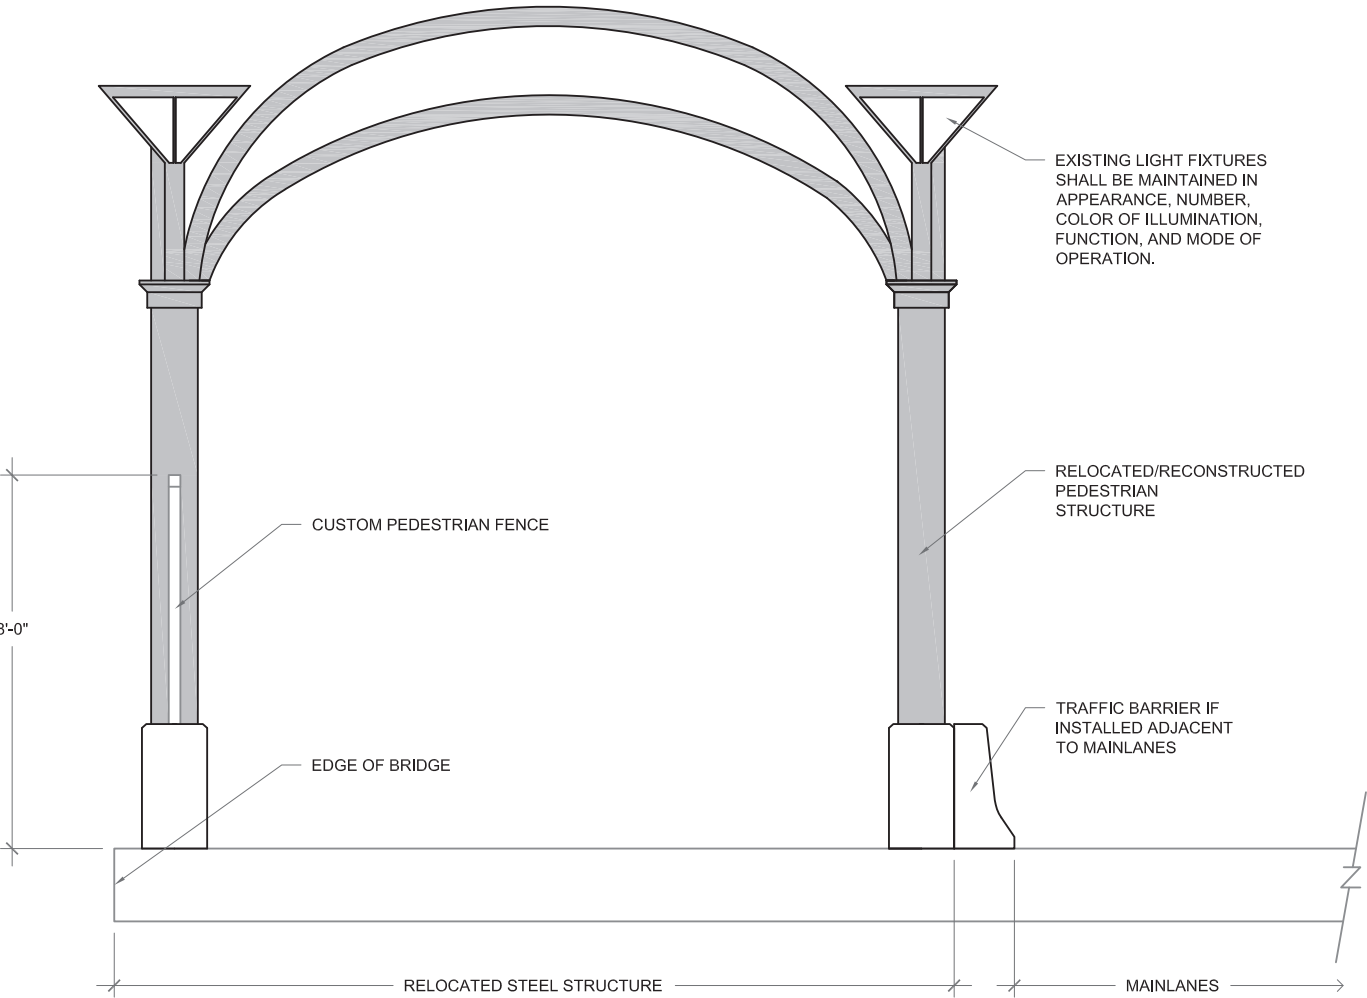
North Staples Street bridge pedestrian crossing with steel pedestrian arch
